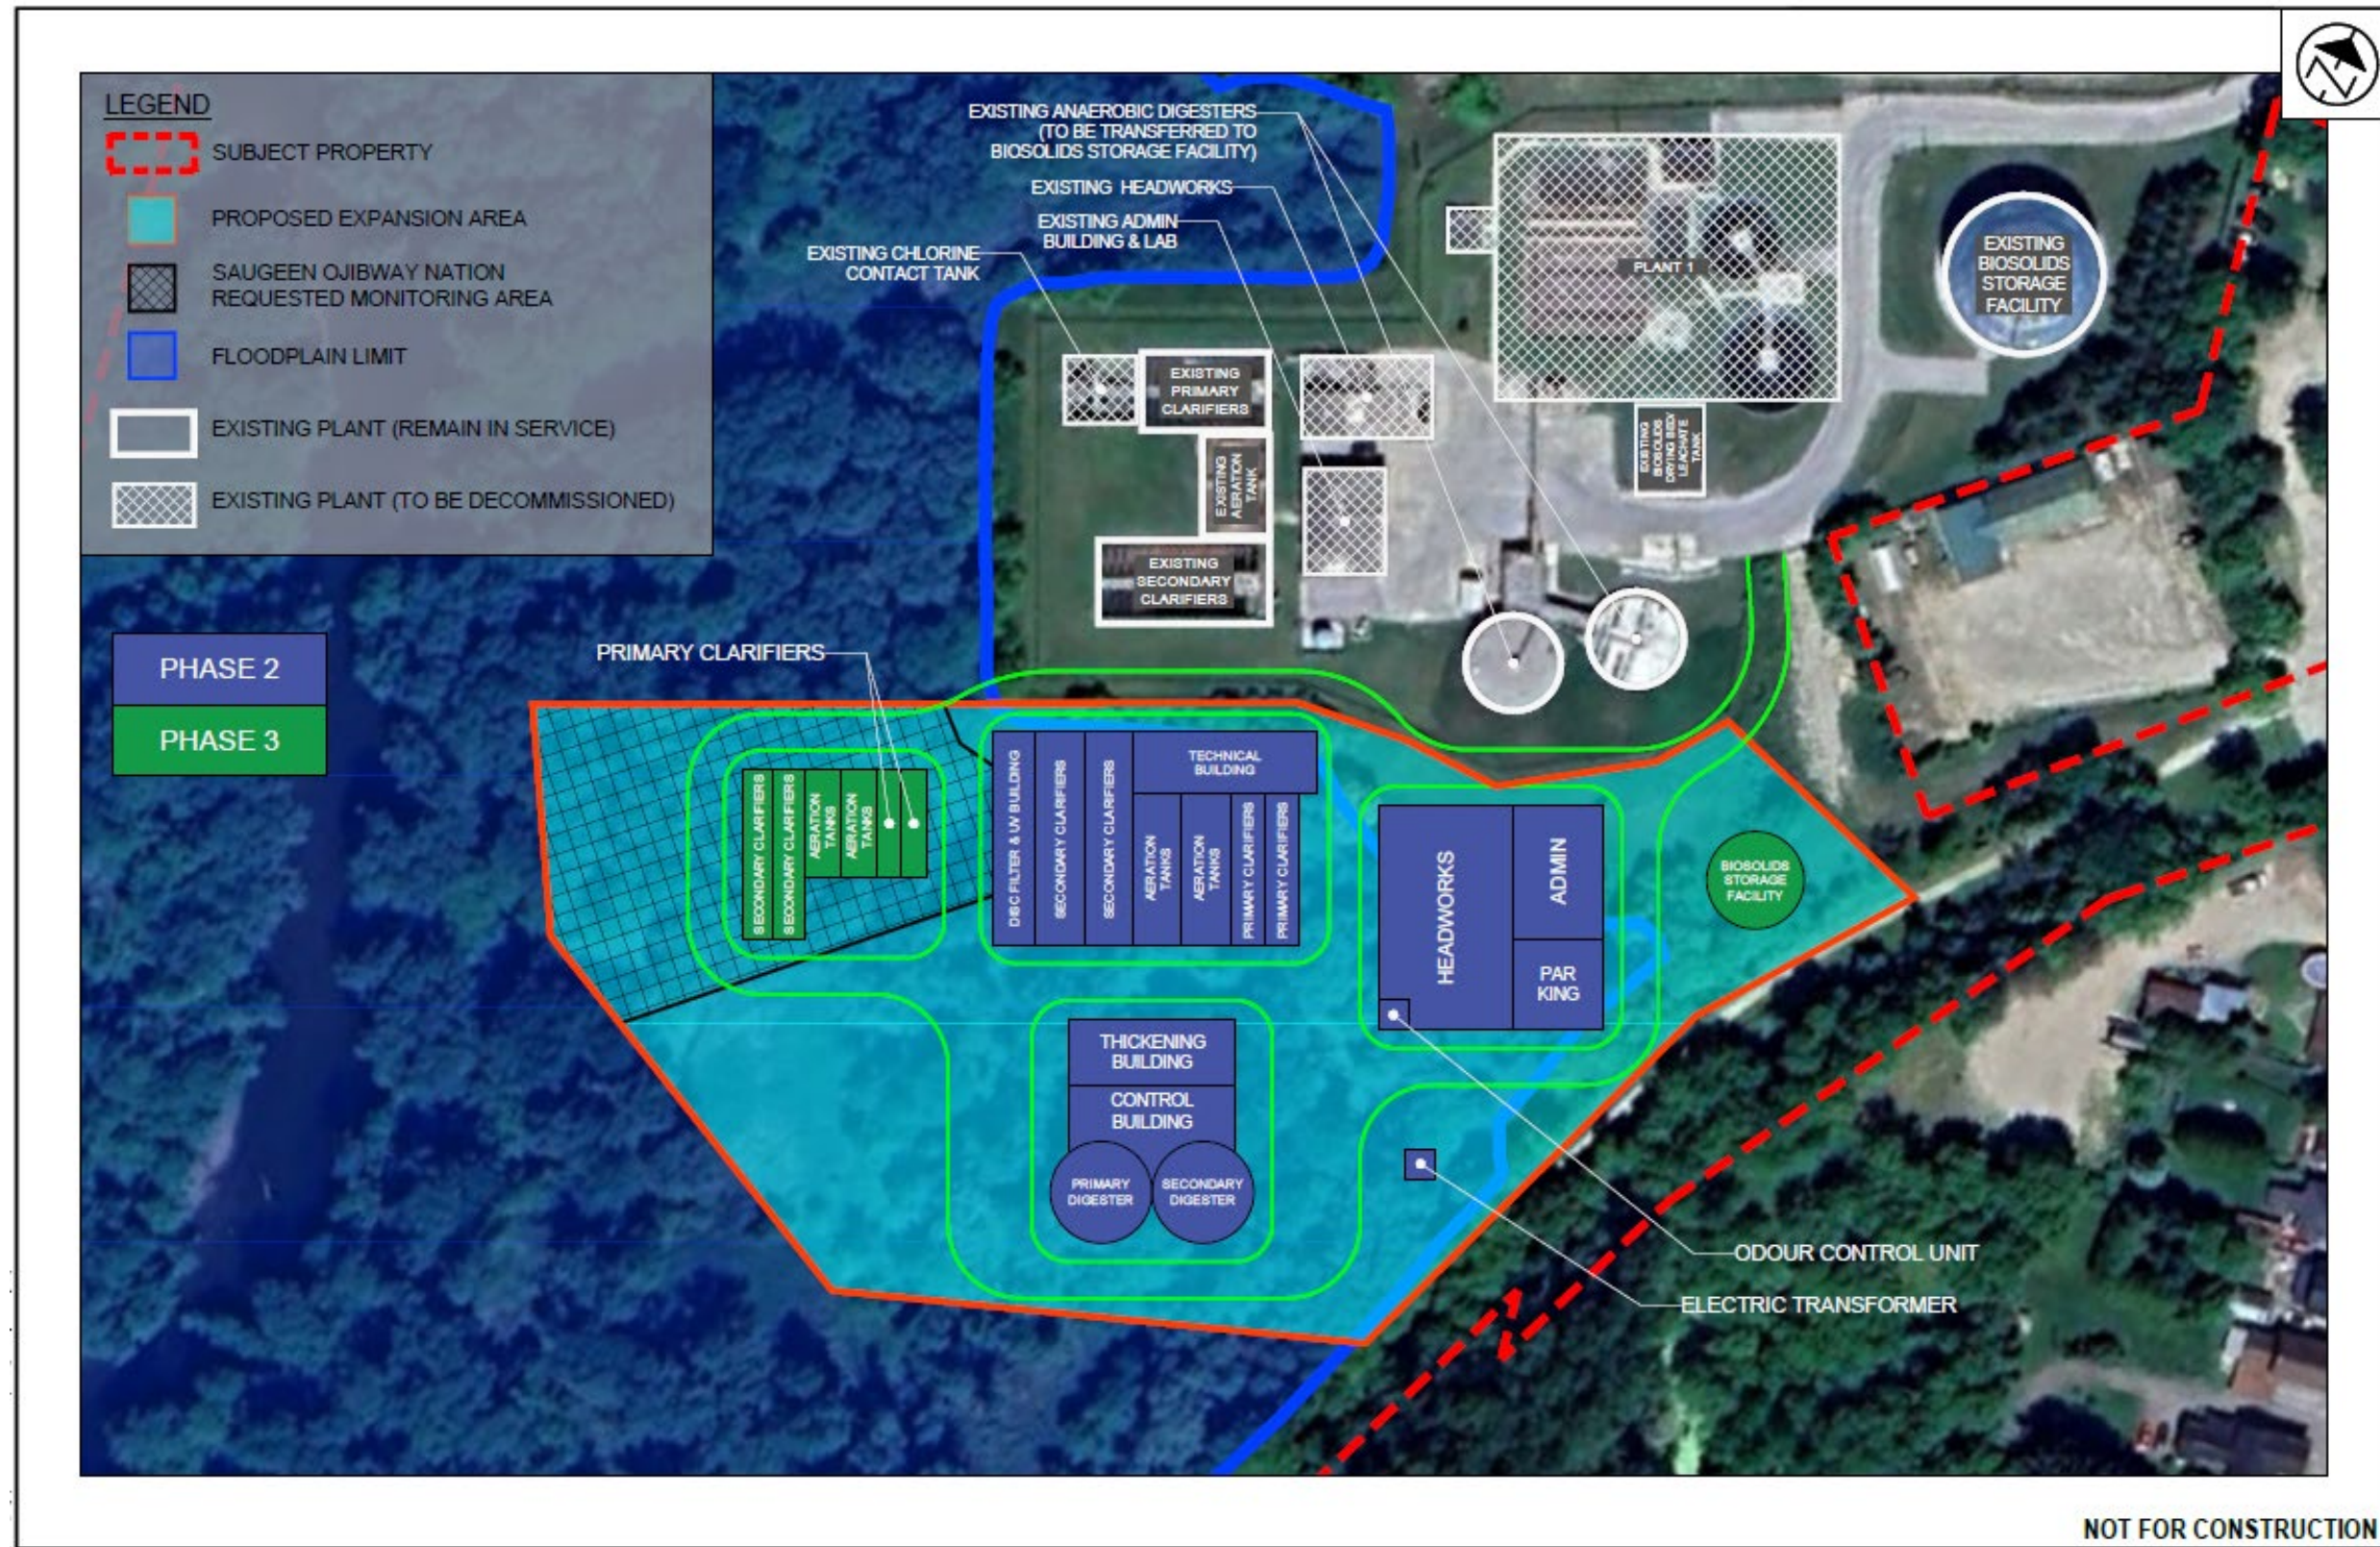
Conceptual Site Plan of Recommended Design Alternative
